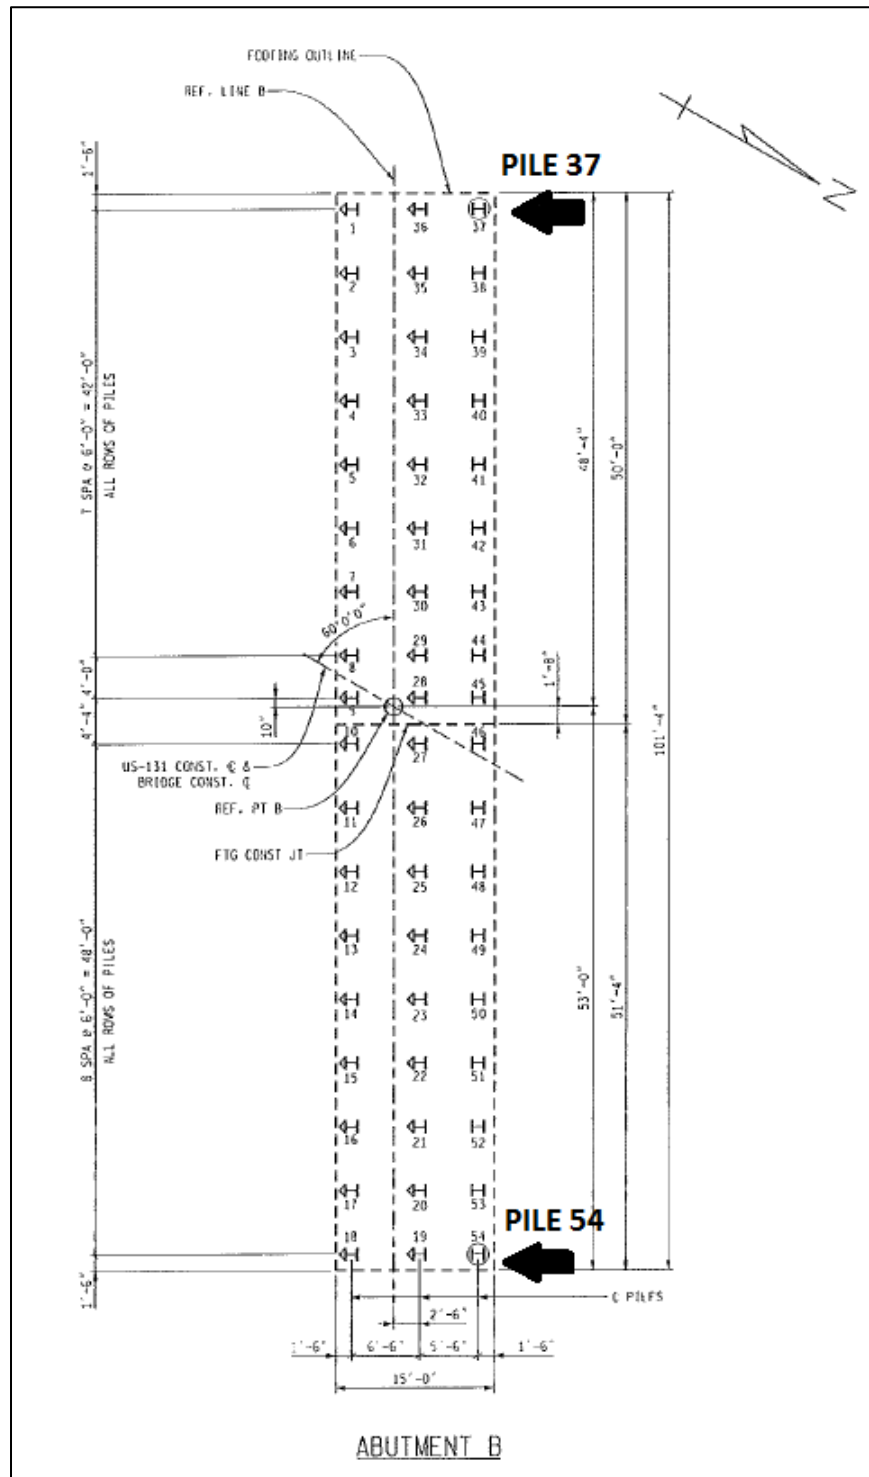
Locations of primary test pile #54 and secondary test pile #37 at US 131B site
